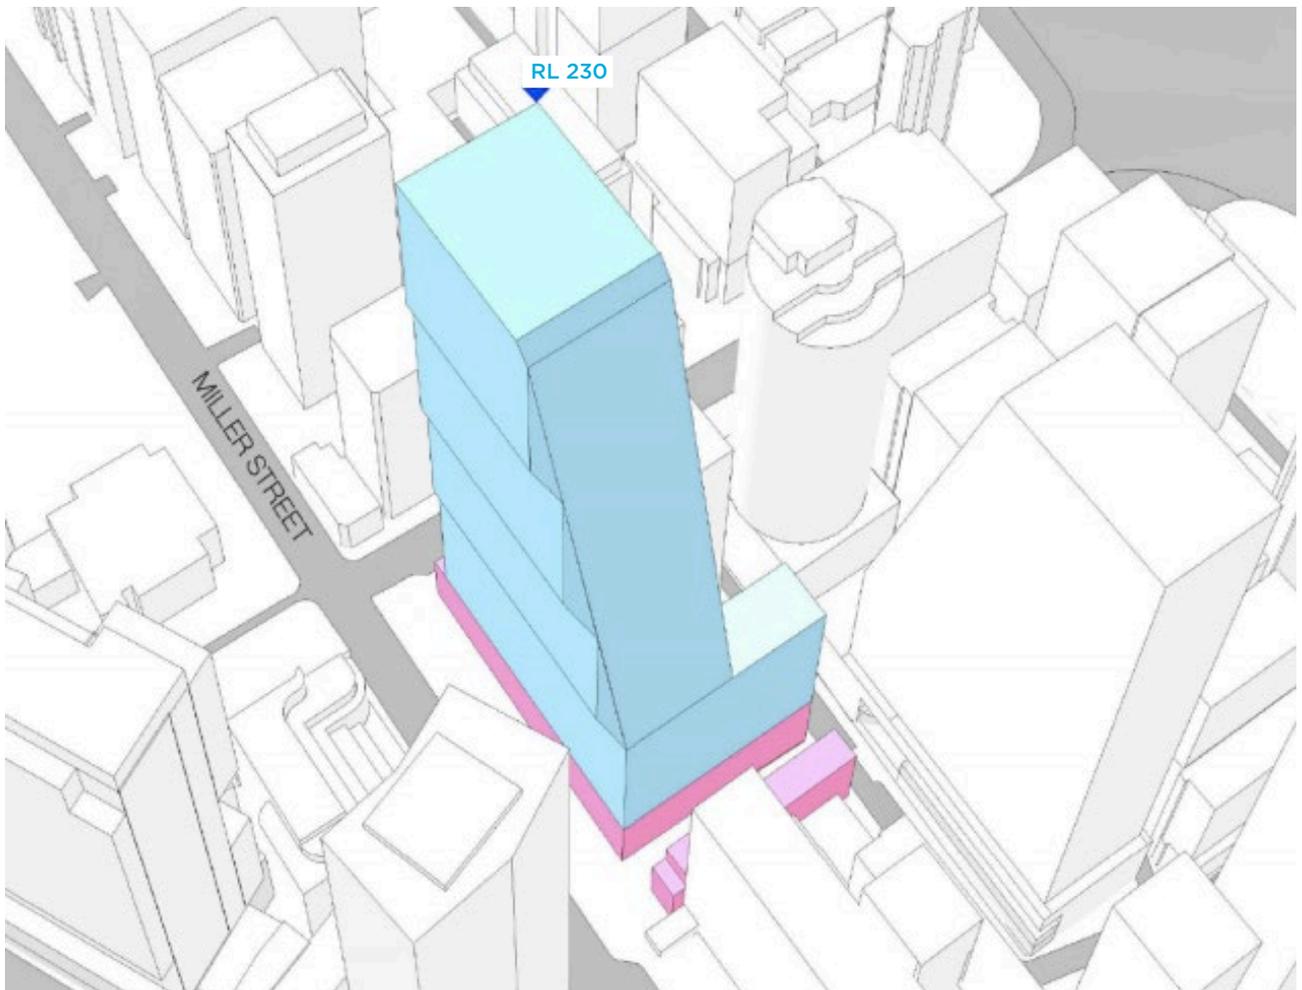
Exhibited proposed building envelope (axonometric diagram from south-west)
